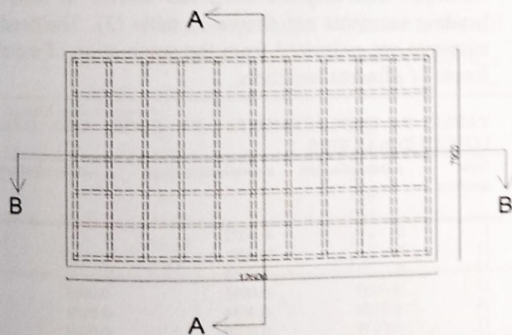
PLAN OF WAFFLE BRIDGE DECK
